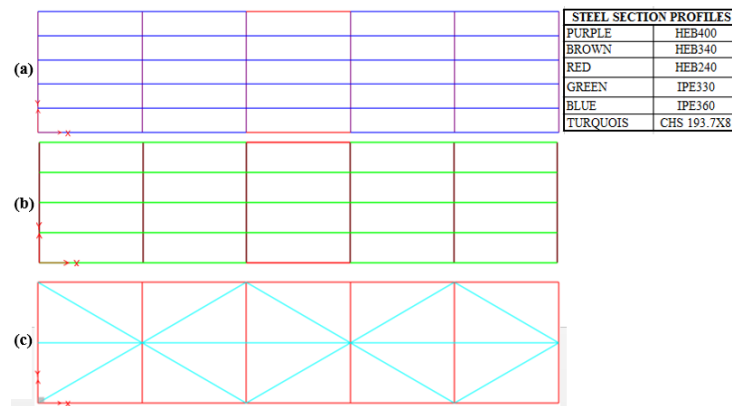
Steel Sections of the (a) Perimeter and Secondary Beams at 2.75 m Height (b) Perimeter and Secondary Beams at 7.45 m Height, (c) Structural Members at the Roof Level.
